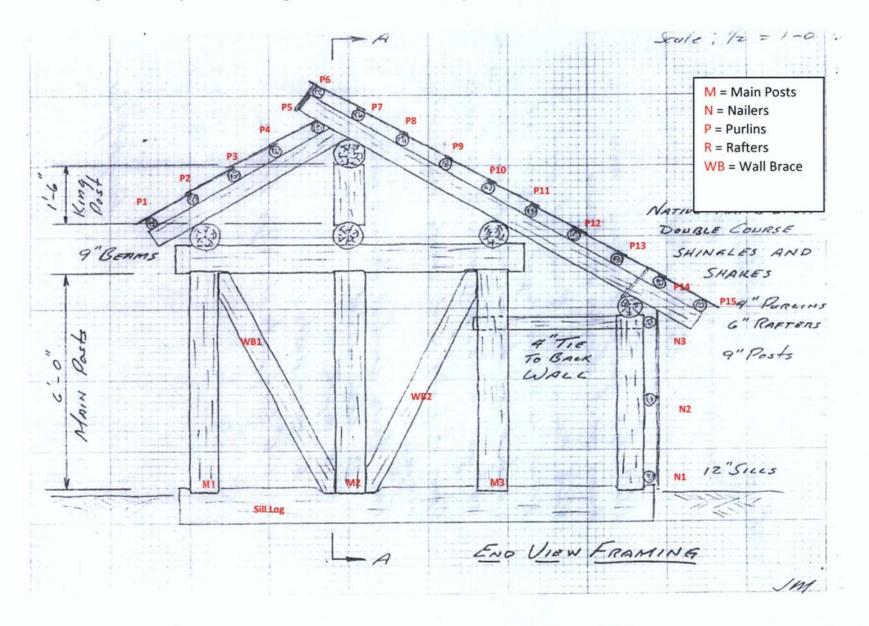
Jerry Miller Drawing of CCC Era Adirondack Style Three Sided Shelter Showing End Elevation
